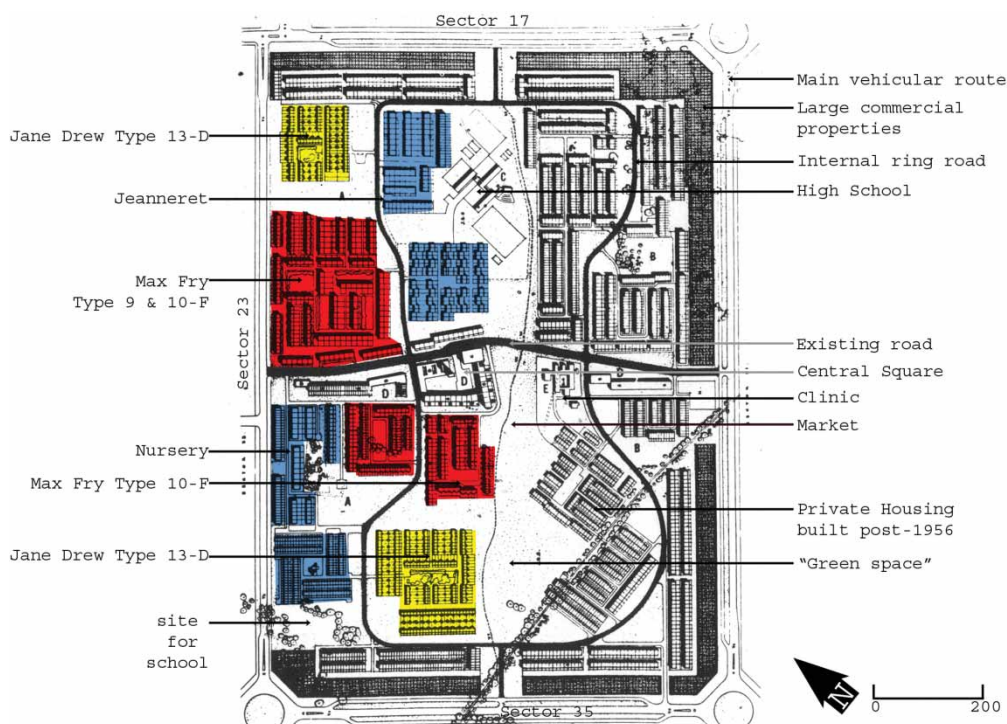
Plan of Sector-22, designed by Jane Drew. Original plan from private archive with additional colouring by the author.
